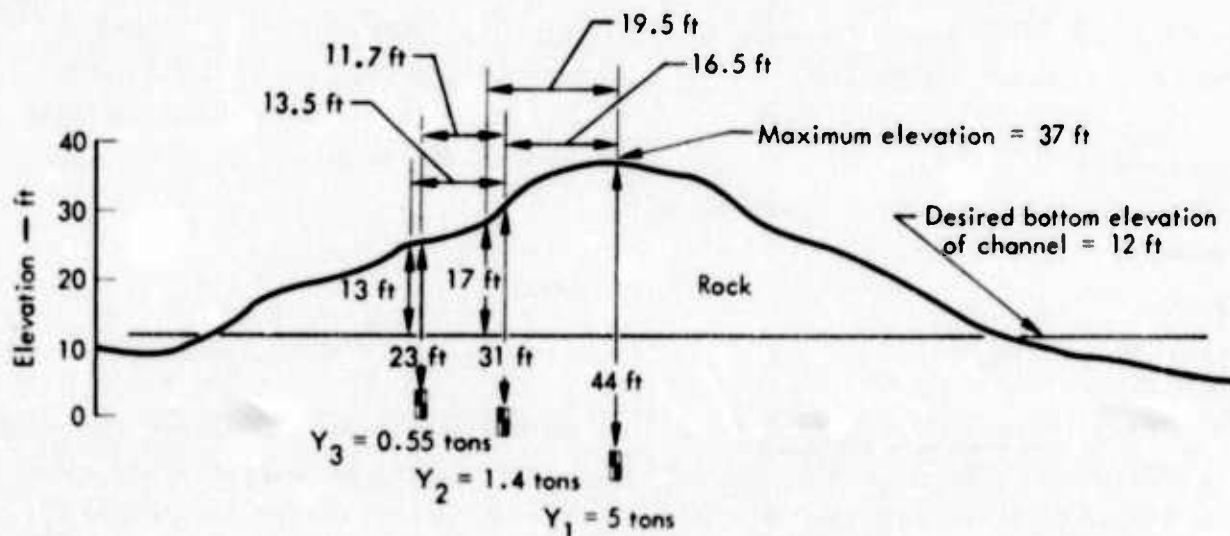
Row-charge design to excavate channel with constant bottom elevation.¹
